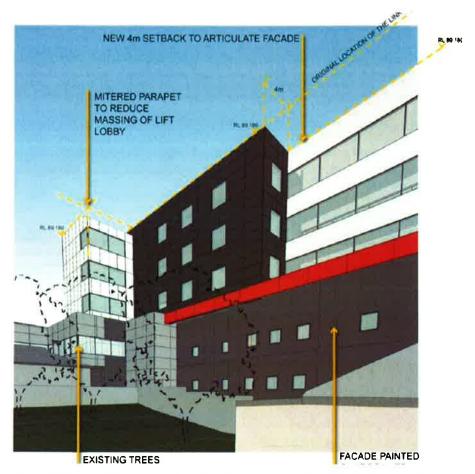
Illustration showing the design amendments to the northern elevation of the proposed new building addressing issues raised following exhibition.
